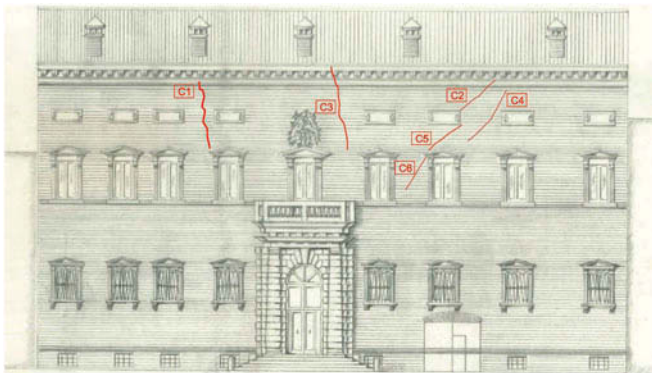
Main facade with the surveyed crack pattern.
